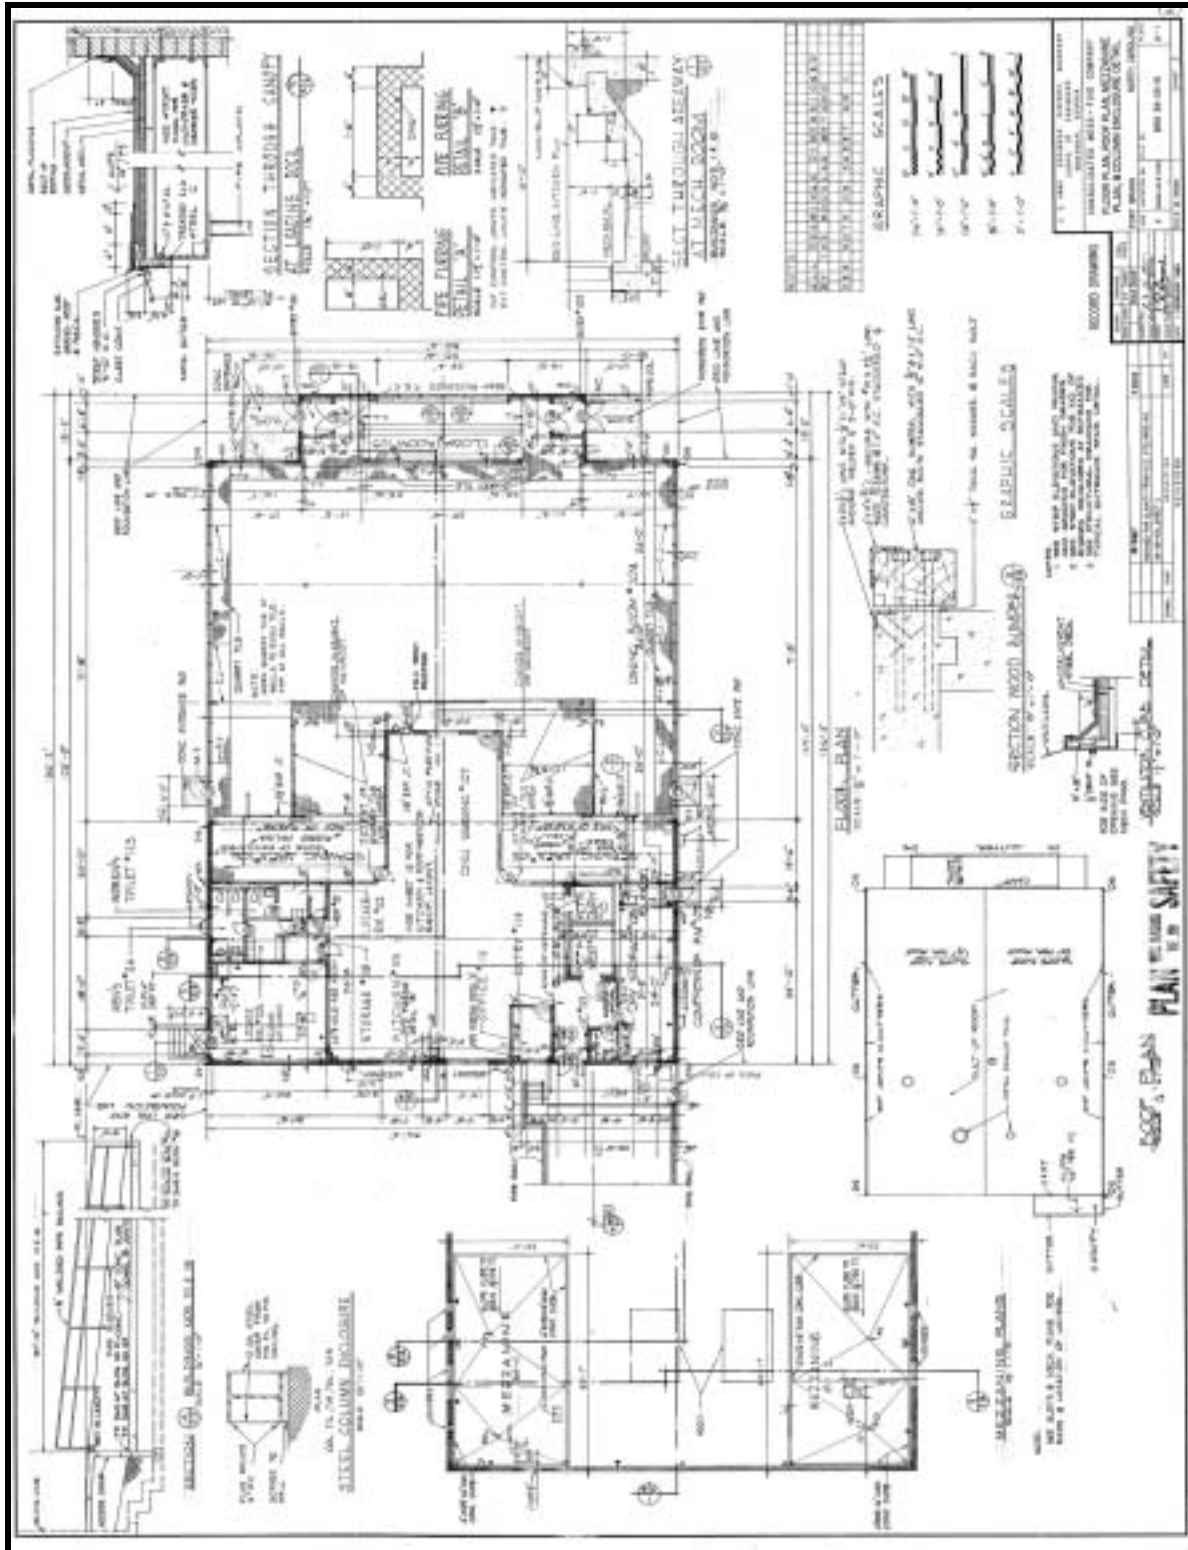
Rolling Pin dining facility, floor plan, Ft. Bragg (1960, revised 1967) (Engineering, Ft. Bragg).
